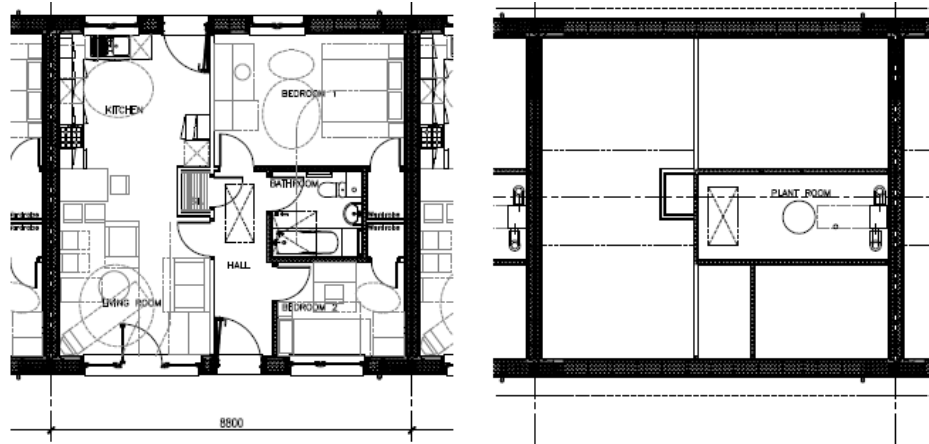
Ground floor and mezzanine floor plan of dwellings 1 and 2.
